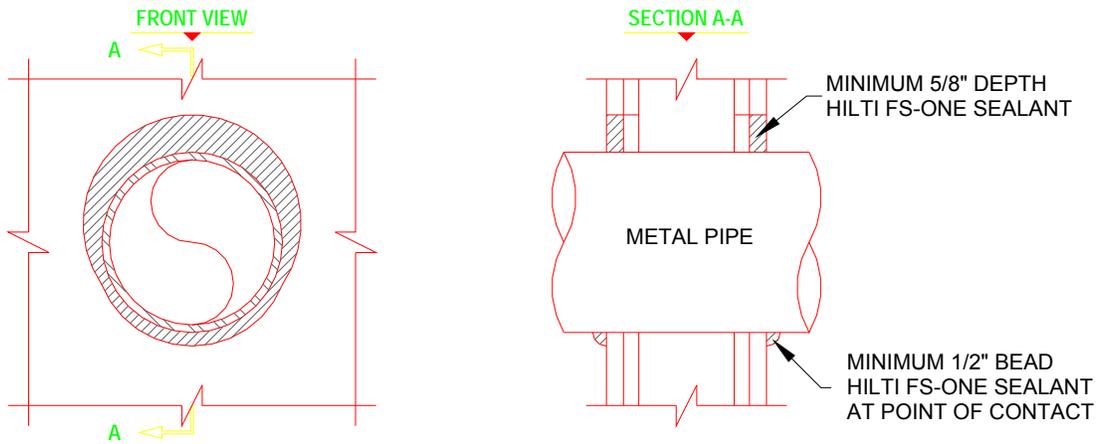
BUILDING SERVICES PIPE THROUGH WALL/FLOOR
